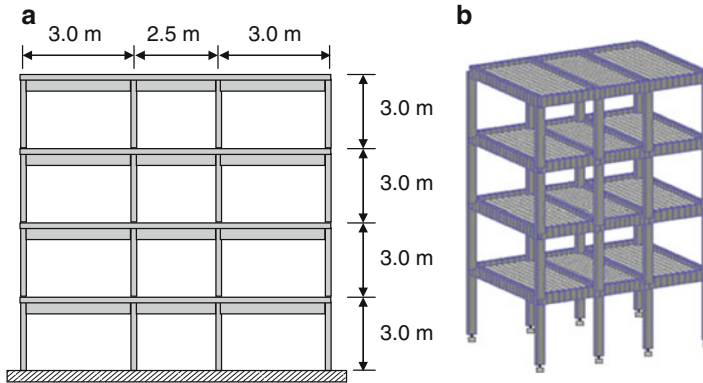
Full scale specimen without the RC infill (a) Longitudinal section with dimensions, (b) 3D elevation of the FE model
